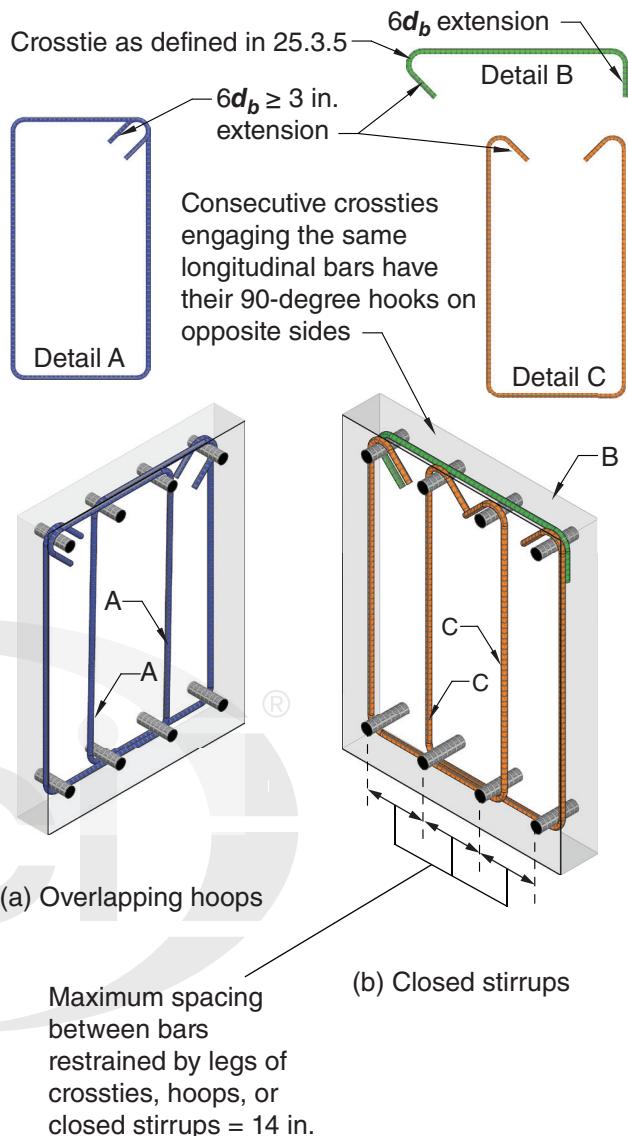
Examples of beam transverse reinforcement and illustration of limit on maximum horizontal spacing of supported longitudinal bars.
